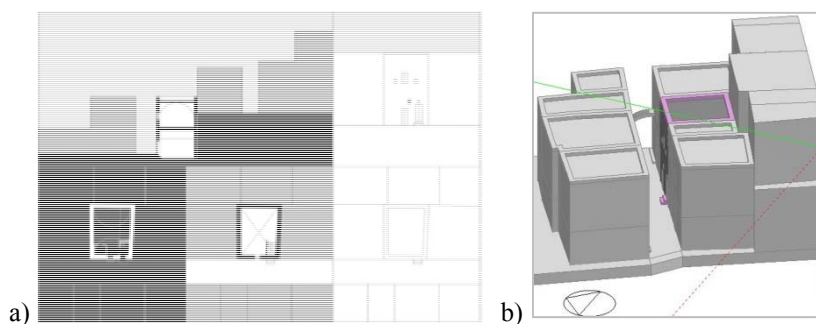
a) The house object of study: vertical section, front, basement's floor, upper floor and roof; b) Model built in DesignBuilder.
